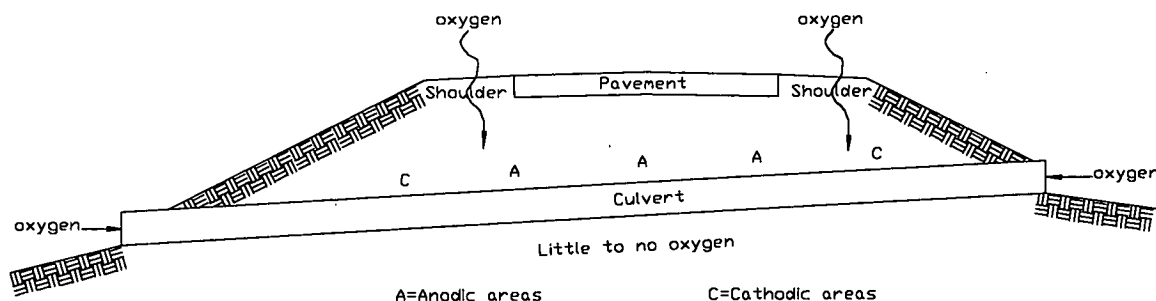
Oxidation corrosion cells in pavement drainage structures (after 2).
